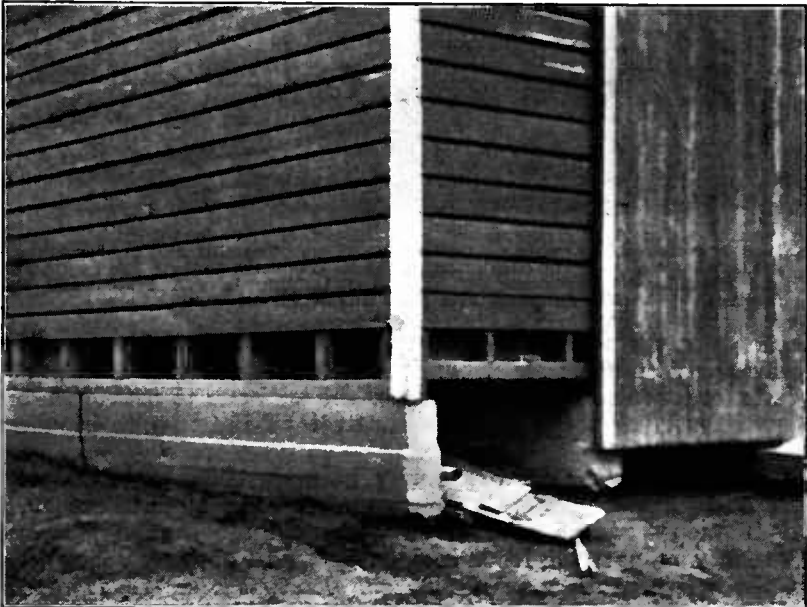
A foundation made insecure by the washing away of the soil underneath
